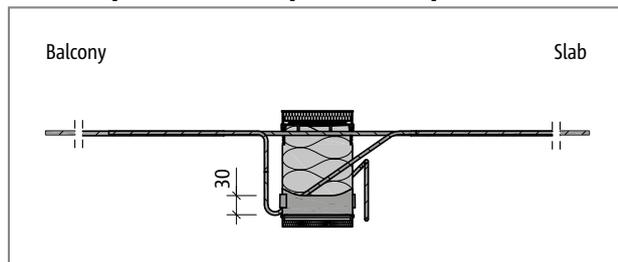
Schöck Isokorb® XT type K-M7 to M10: Product section
